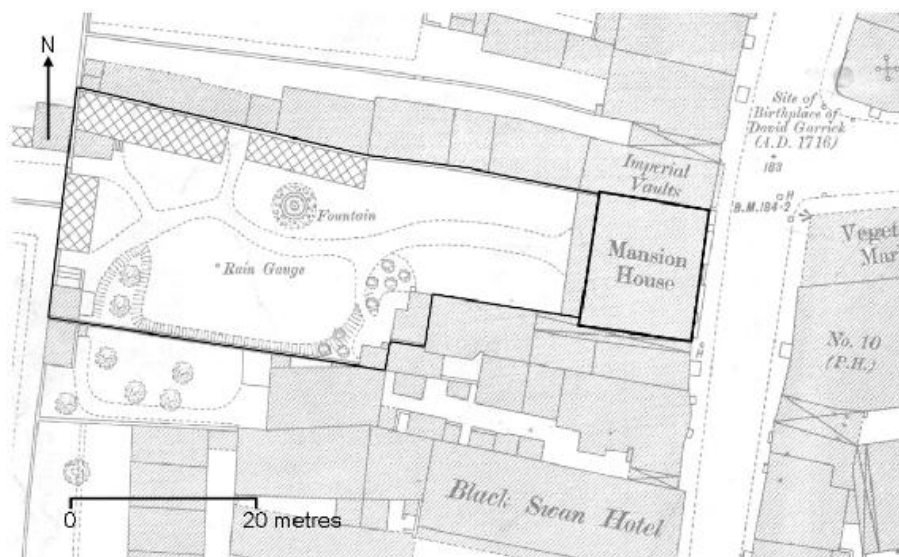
Location plan for the Mansion House (building 24), Widemarsh Street, based on the first edition Ordnance Survey 1:500 plan of 1884 – pre-dating its conversion to shops and the insertion of an entry, bisecting the house and its ancient plot
